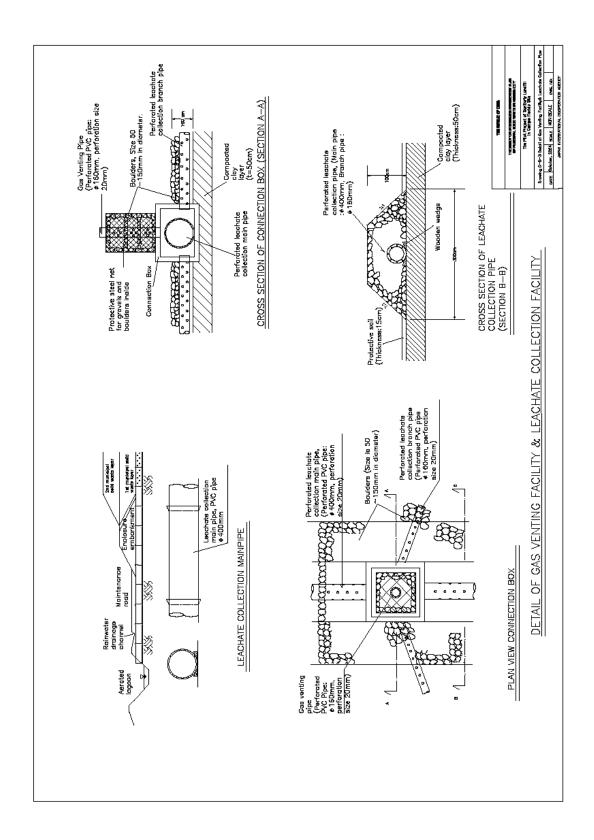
Details of Leachate Collection System in Campo Florido Landfill Site
